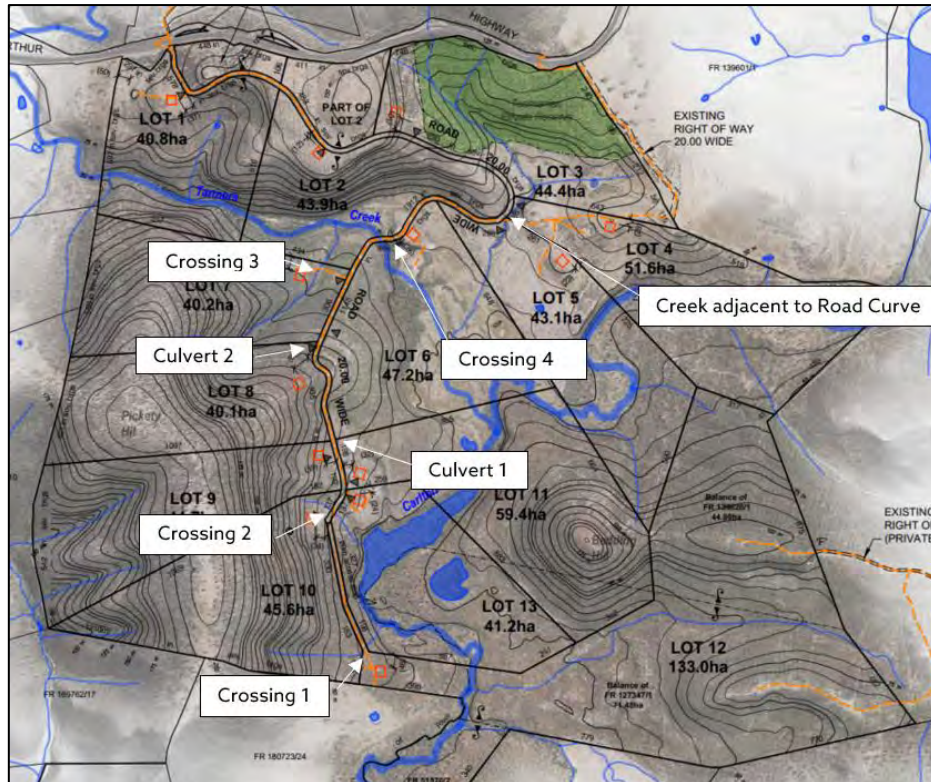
Site Plan with Labelled Watercourses and Landmarks
